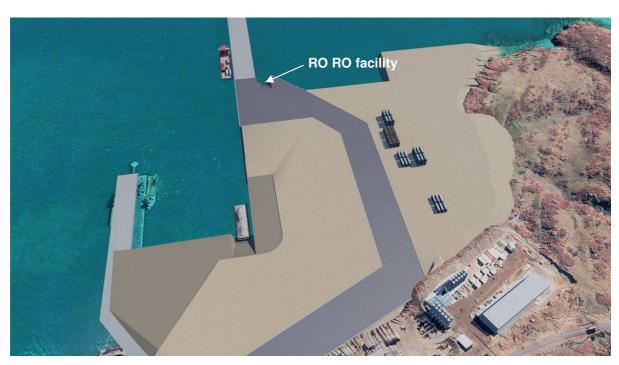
Photomontage of DMSF in particular the roll-on roll-off facility
